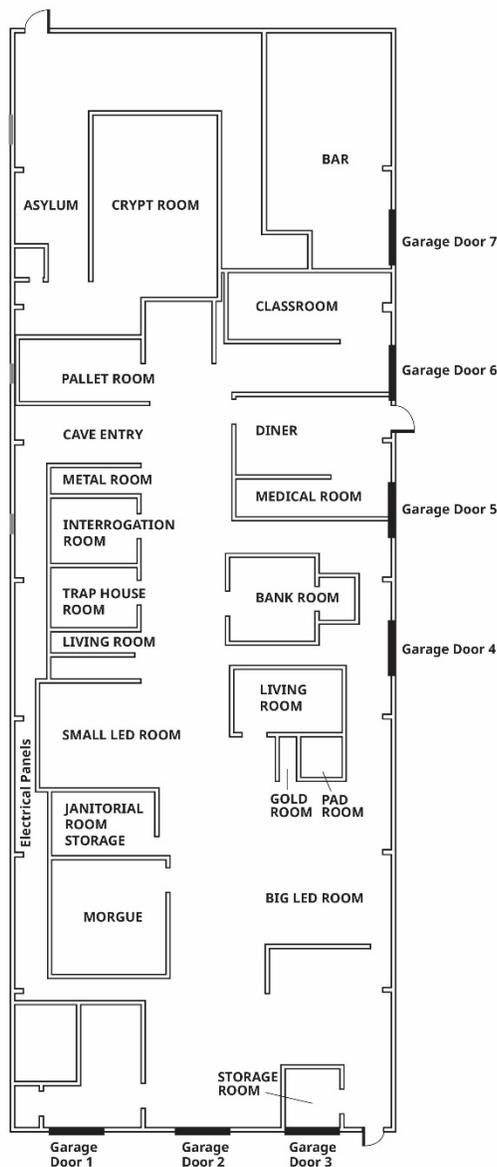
Floor plan of warehouse showing temporarily, theme-constructed rooms. (Courtesy of the fire department)
